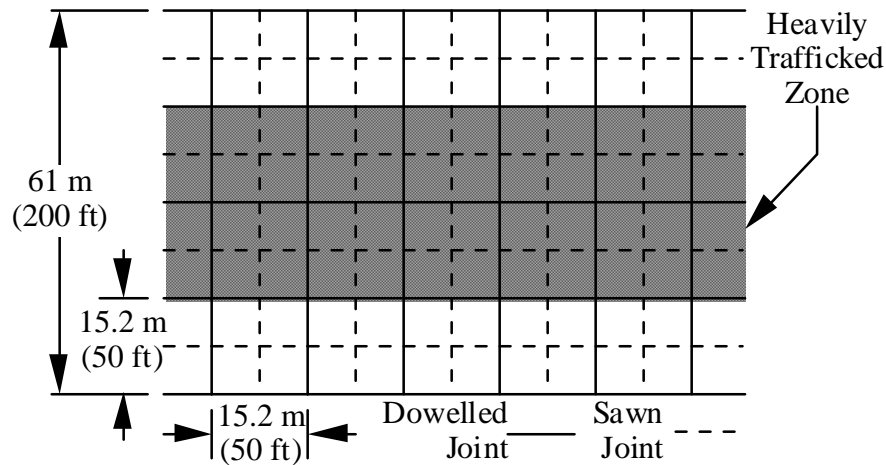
Plan View of Typical Section of Runway 17R-35L, DFW International Airport
